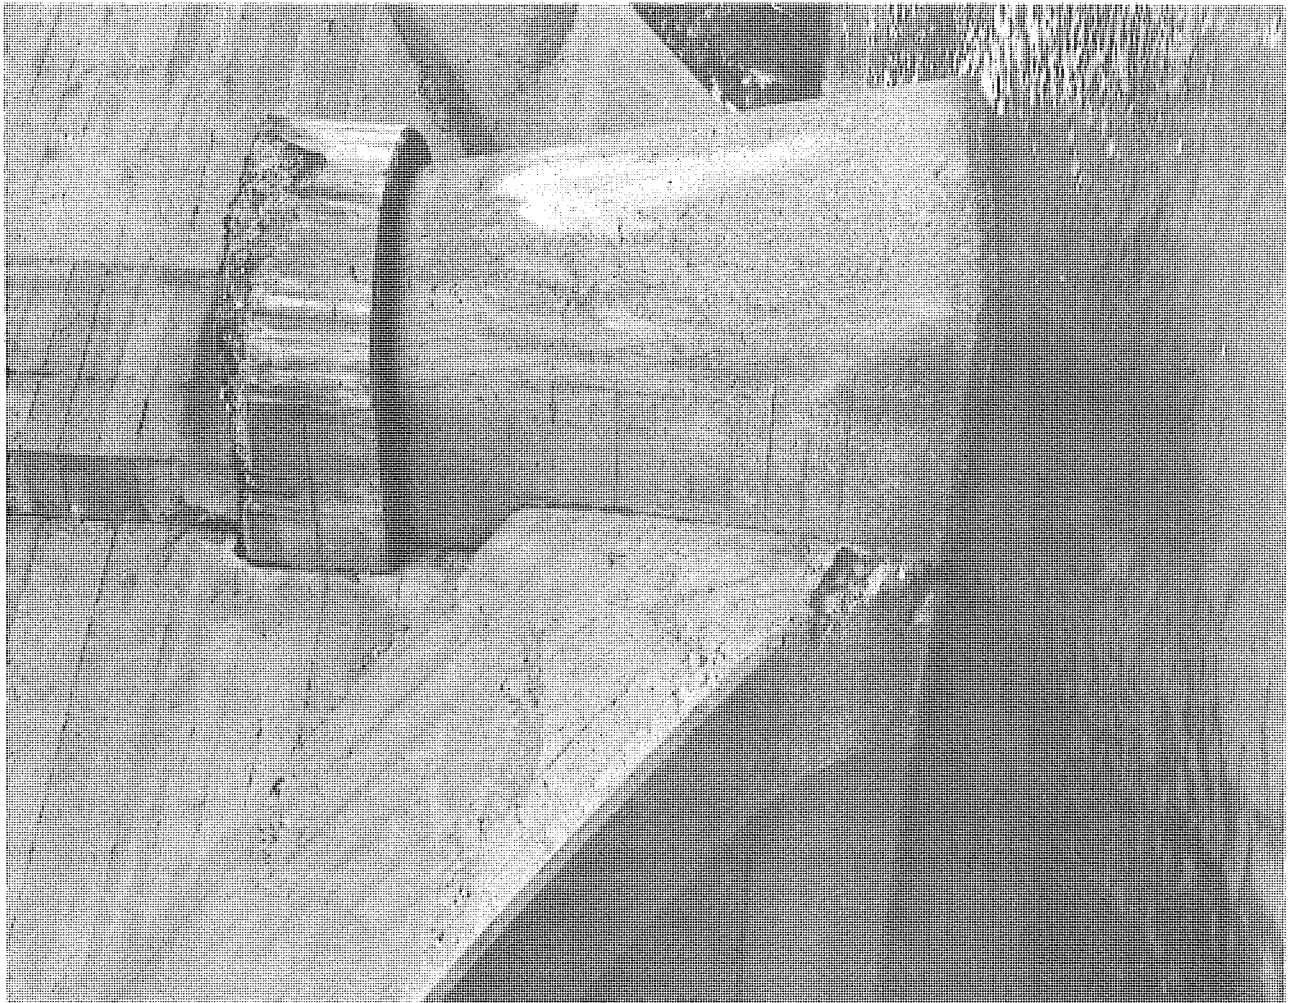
General area and close-up views of poor concrete consolidation and heavy scale on the west end of the south pier.
